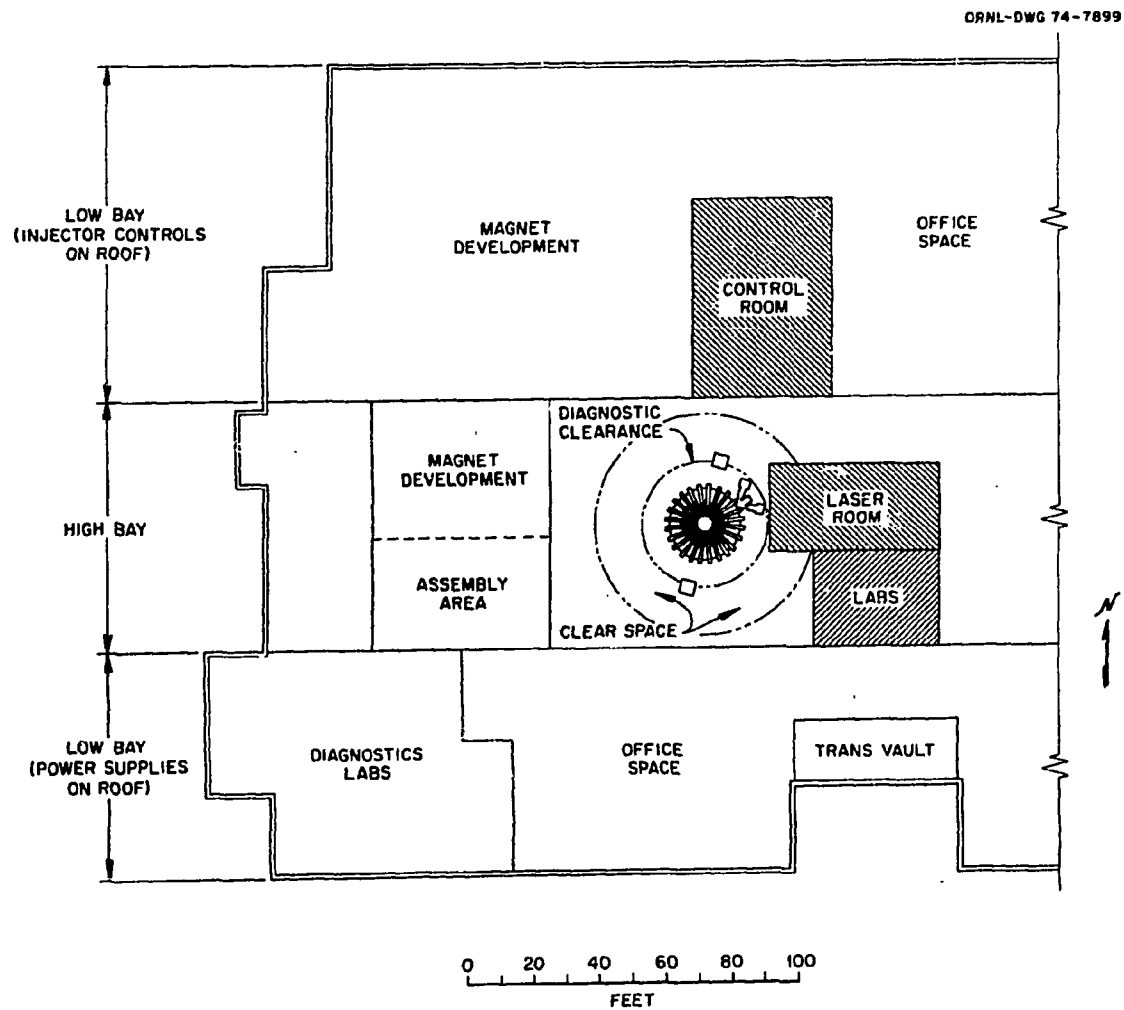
Building 9204-1 Plan Showing Reference TTA Location
